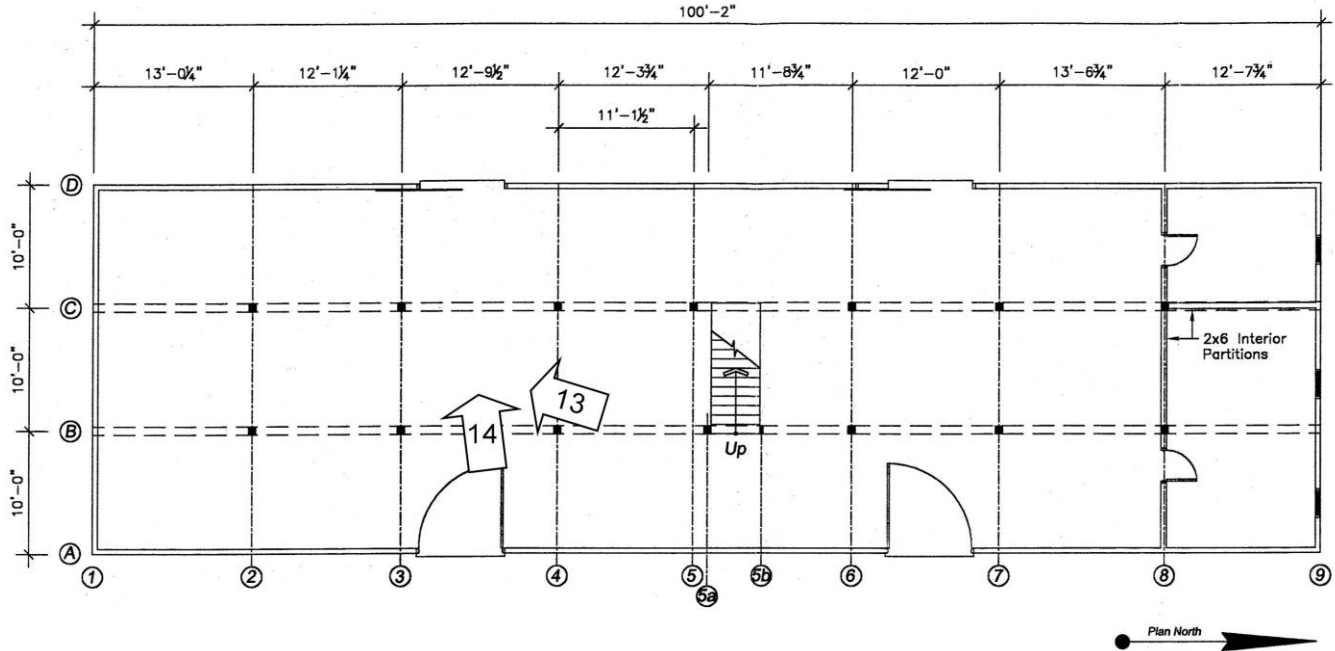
Storehouse first floor plan and photo key. (Image from Maine Bureau of Parks and Lands files.)
